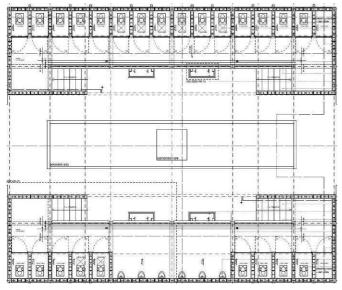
Floor plan of the UDDT block. Top: female section with 15 cubicles; Bottom: male section with 9 cubicles and 6 urinals in the middle (source: GTZ-IS, 2008).
